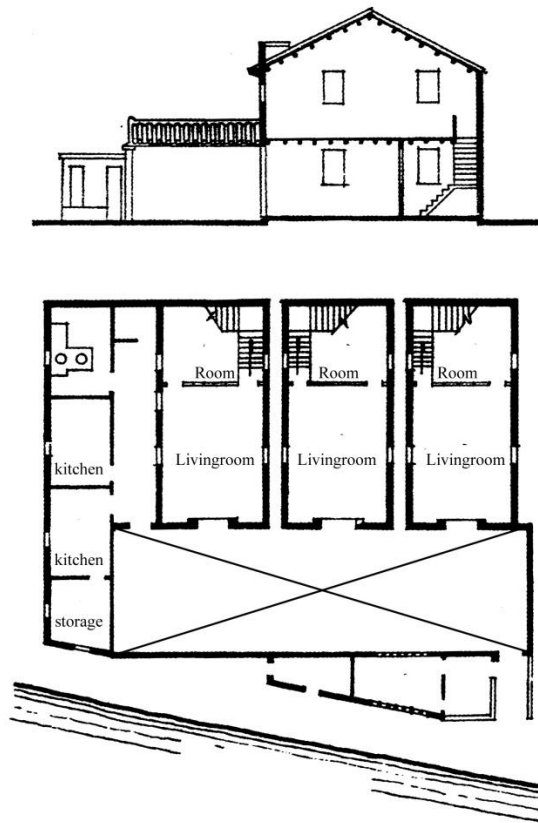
Ground plan and section of a *zhutongwu* in rural Guangzhou. Sources: Lu (2008: 67)
